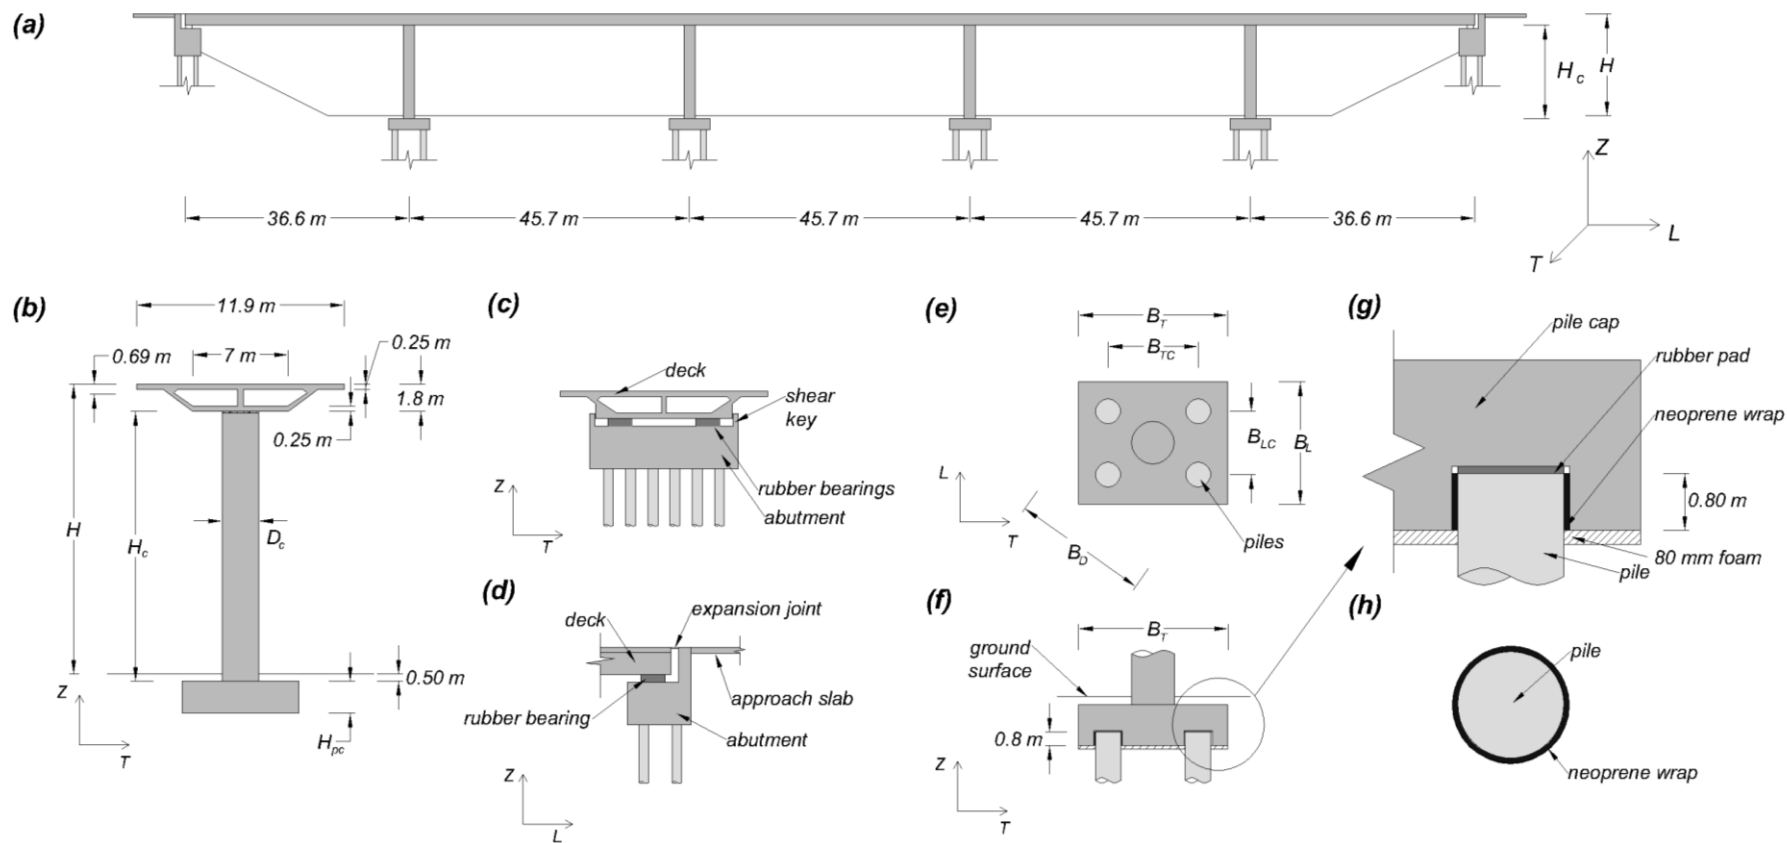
Geometric characteristics of the bridges: (a) side view of the whole bridge; (b) elevation view of the foundation-column and deck of bridge RSF17; (c) elevation section view of abutment, bearings, and deck of the bridges; (d) side elevation view of abutment, bearing, deck and expansion joint of all bridges; (e) plan view of the pile foundations; (f) elevation section view of the rocking pile foundations; (g) elevation section view of pile cap to pile connection of the rocking pile foundations; and (h) section view of pile and neoprene wrap of the rocking pile-foundations.
